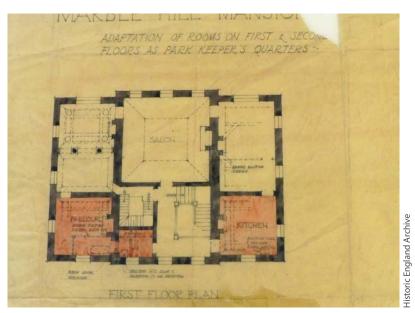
LCC floor plans for alterations to the first floor for the park keeper's accommodation, 1950s
